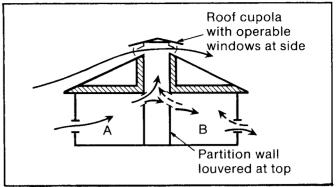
Whole-House Ventilation Through Roof Level Outlet Windows and Low Inlet Windows (Dotted Arrow Shows Alternate Possible Flow Path)
